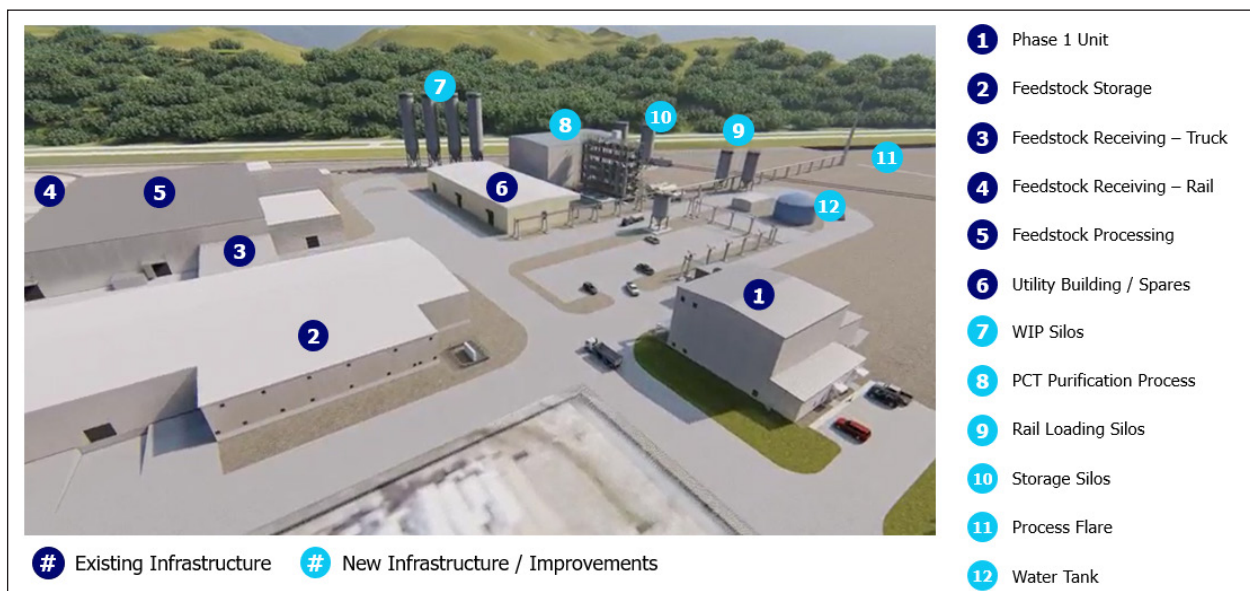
Facility site plan overview of the Ironton, Ohio, PureCycle plant.
